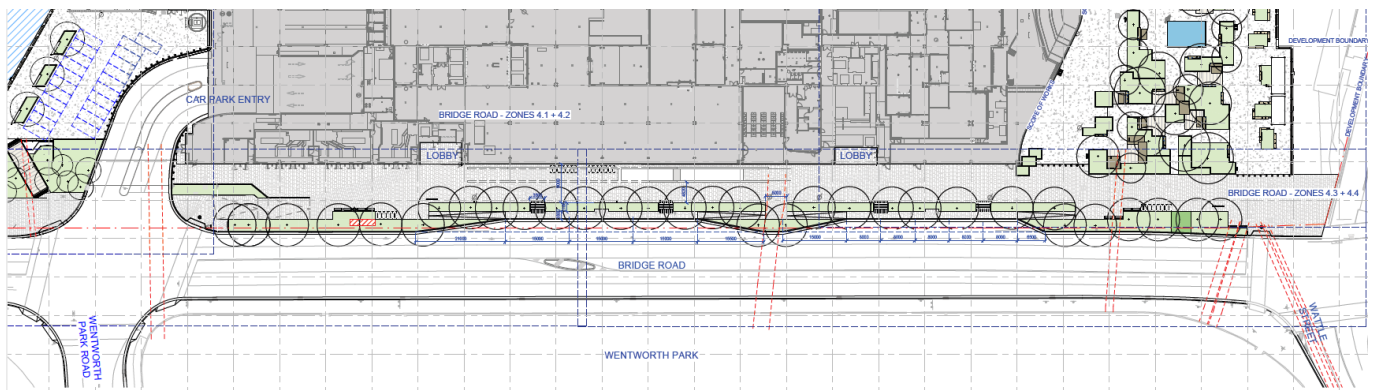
Proposed landscaping and access from Bridge Road to the shared zone
